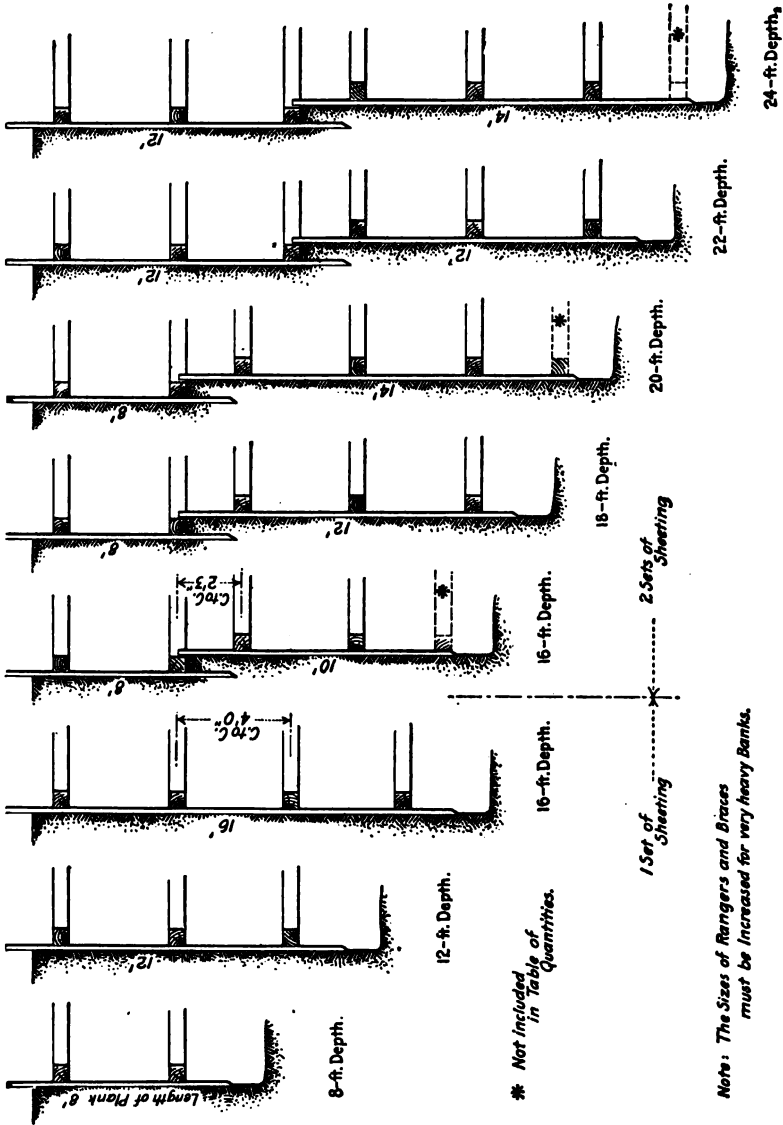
A method of shoring ordinary narrow sewer trenches.
